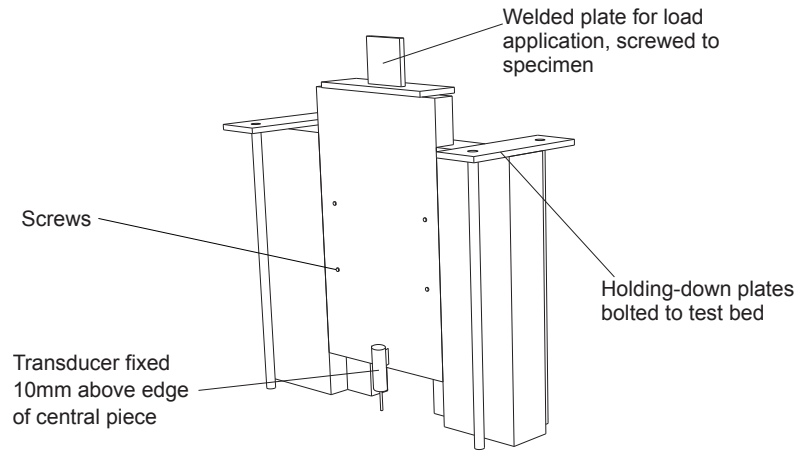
Test setup for lap joint between adjacent CLT panels with screws.
